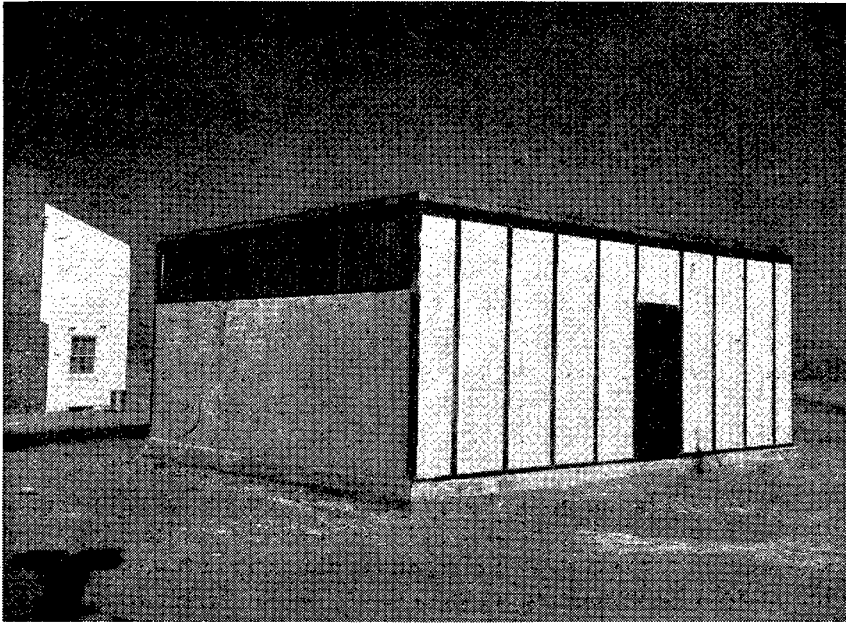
Union Carbide Building (Before)—This blast-resistant control room prototype, built with reinforced gypsum walls and roof on a welded steel frame, was designed to resist blast pressure at the 5,500-foot line.
